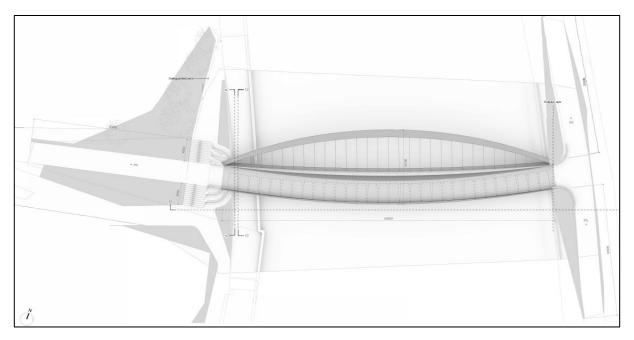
Drawing showing arial view of the bridge and the bridge's west landing.
